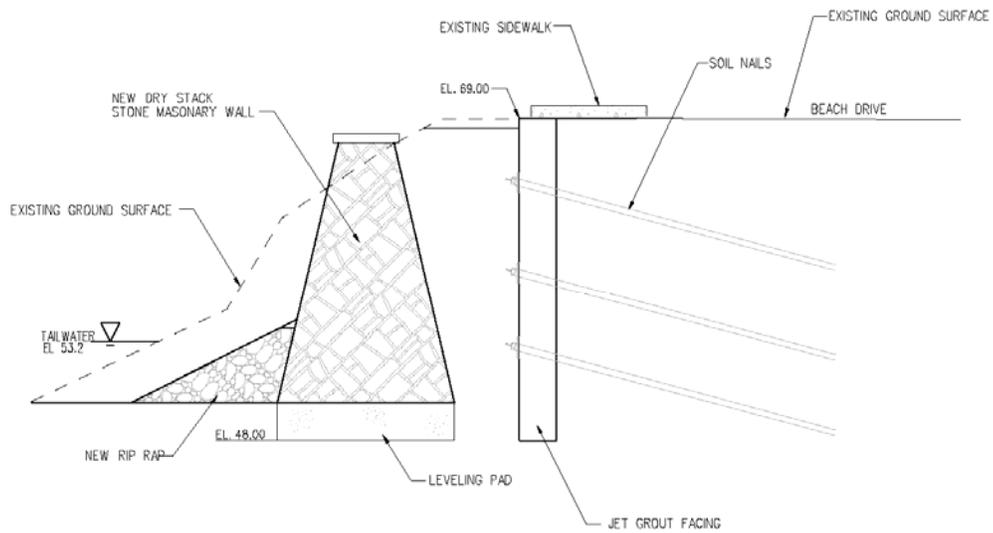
Cross Section C through Soil Nailed Wall Below Downstream Entrance to Fishway (KCI 2003)
